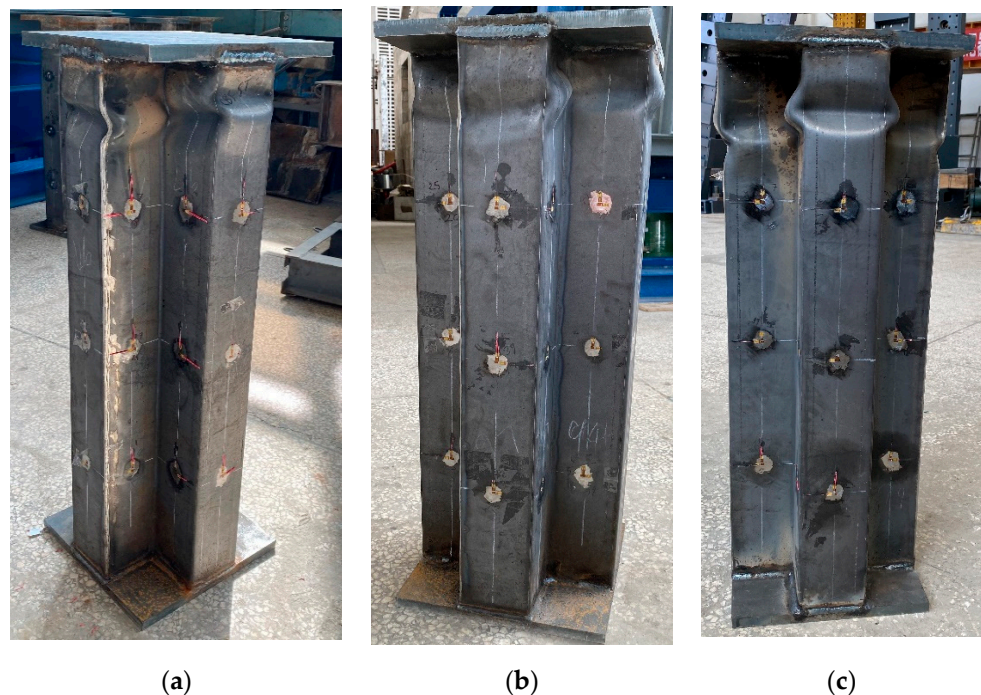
Cross-shaped ST specimen's failure modes: (a) MC-ST specimen; (b) SC-ST specimen; (c) OC-ST specimen.
